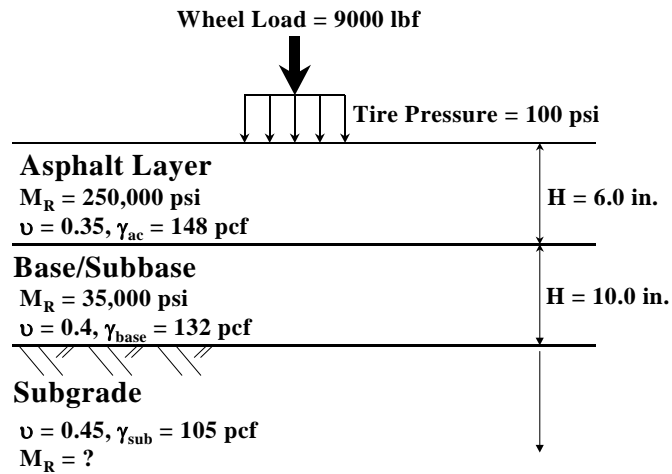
Typical Pavement Section for Resilient Modulus Determination
